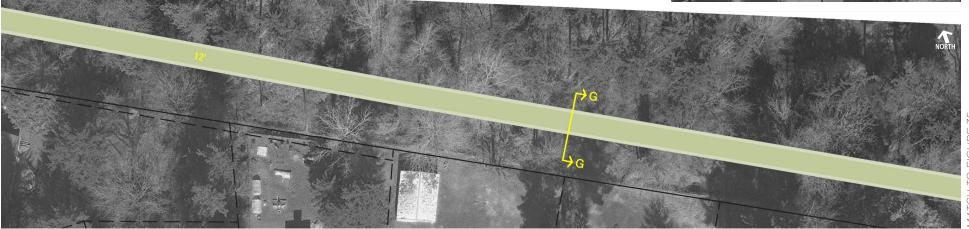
Trail makes a trail connection at 161st Ave SE in undeveloped WSDOT right-of-way and continues east.
